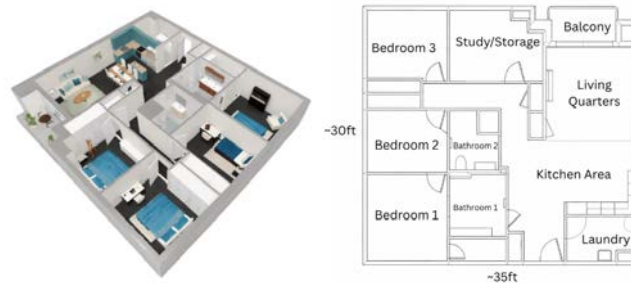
Standard family housing unit: 3D render and floor plan.
